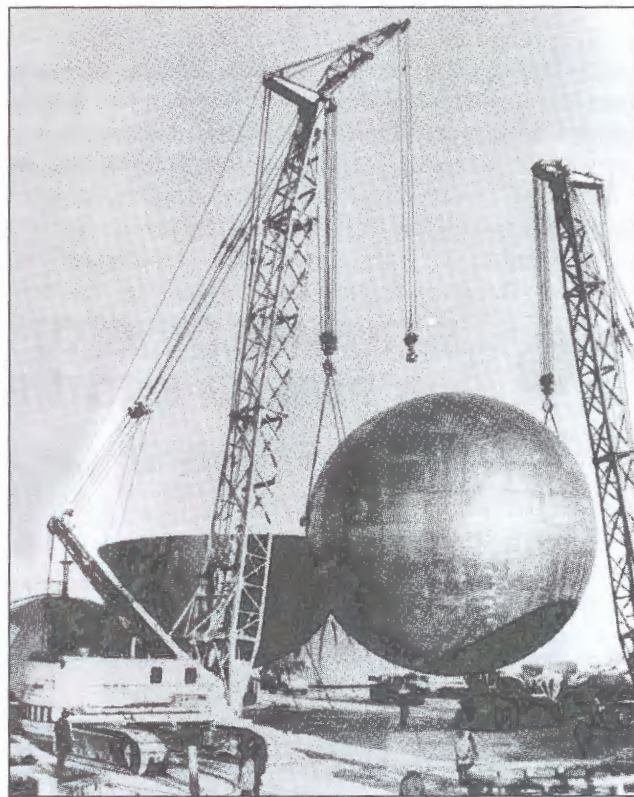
Erection, assembly and welding of the isothermal set
